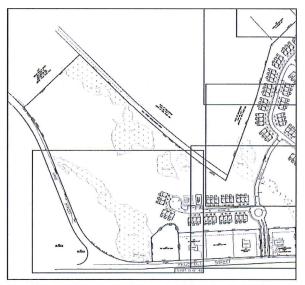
Snippet from sheet 10 of 43 from the "Special Residential Townhouse Development Plan – "Prospect Hill Village" dated November 30, 2023 currently in front of the Bellingham Planning Board and Conservation Commission. Note approximate location of Lot 1 and Lot 2. Scale: 1"=120' (Note: scale is not true to size on this document)
